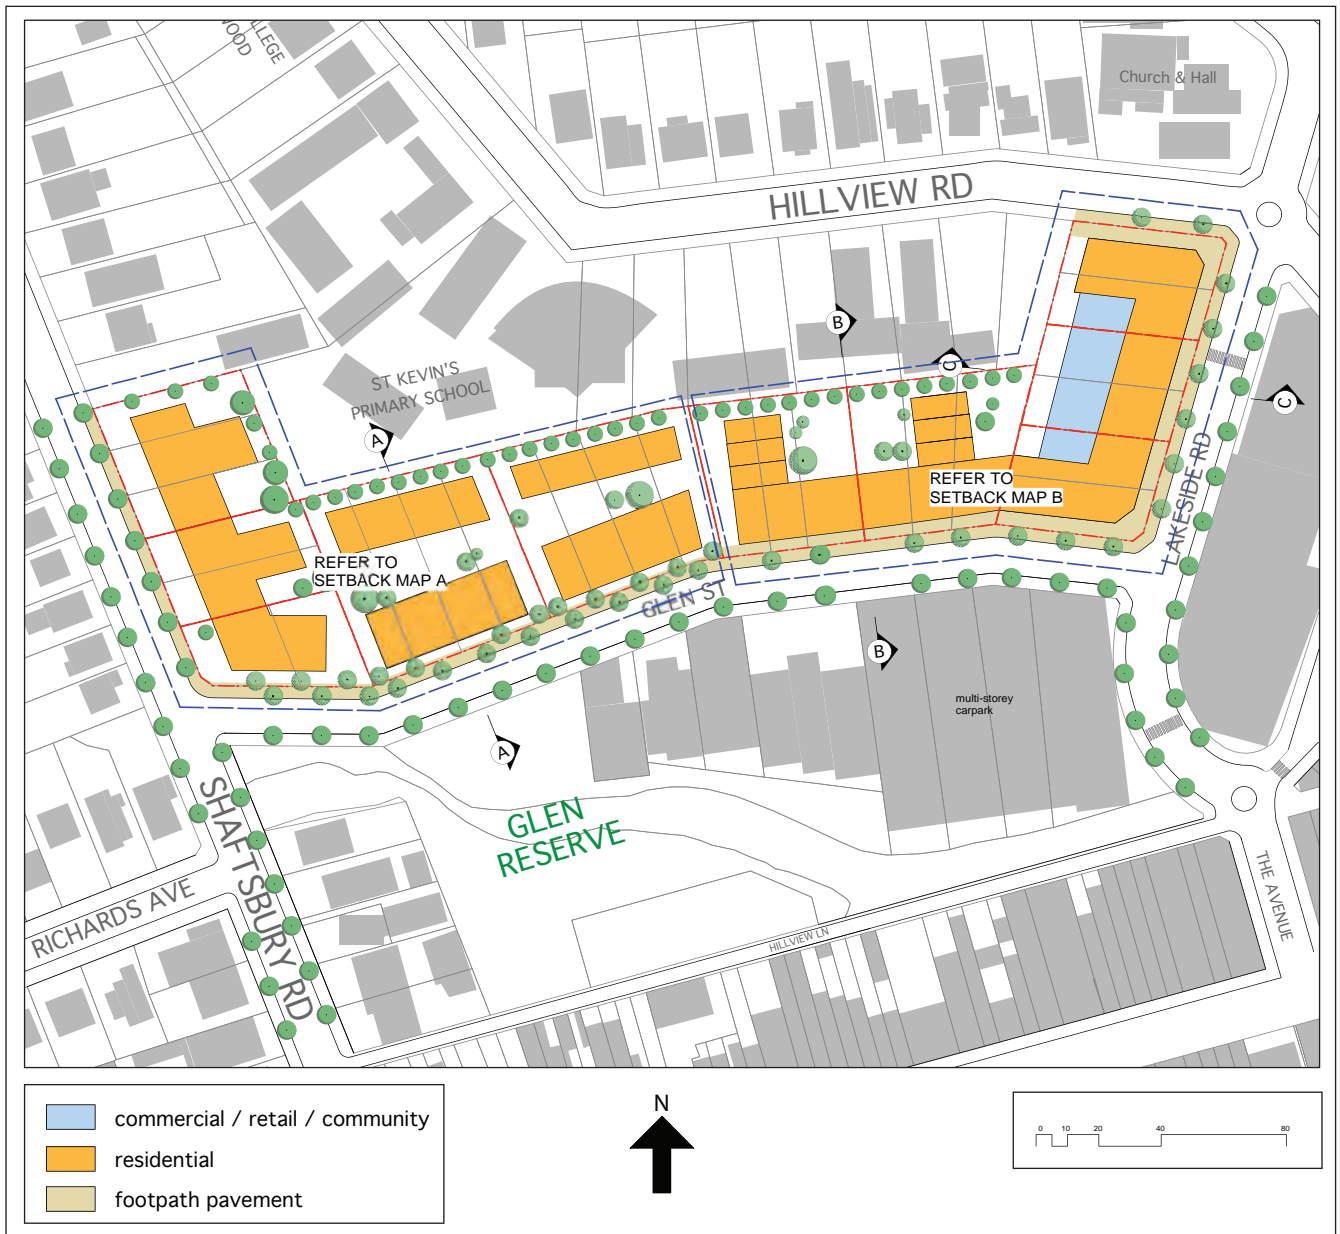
Glen Street and Lakeside Road Setback Control Plan.
